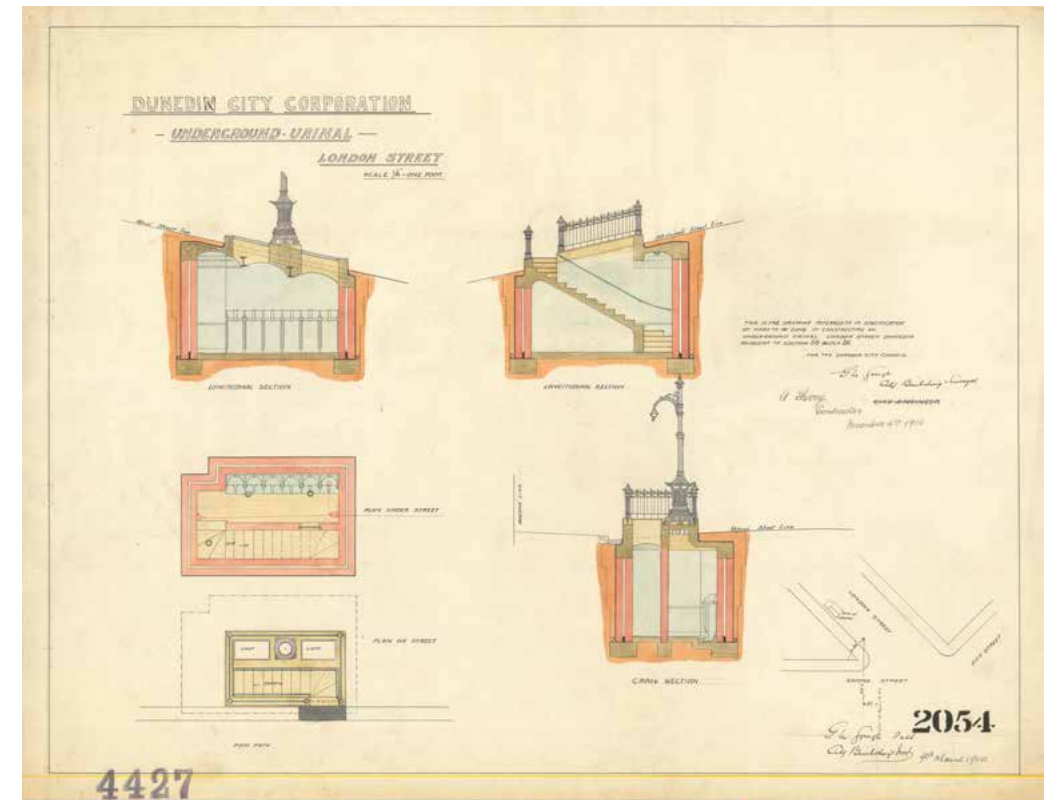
London Street Underground Conveniences, Plan 4427, City Engineers 14/2/2ba
